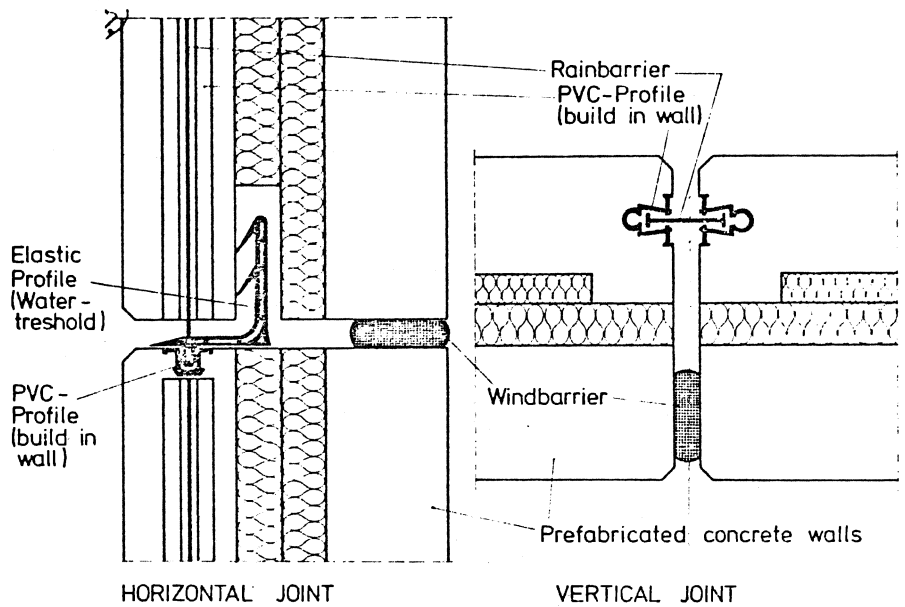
Two-stage joint construction in a concrete sandwich wall element, with embedded plastic profile pieces.
